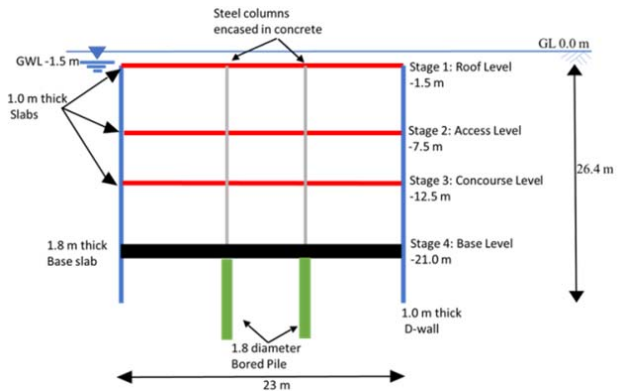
Geometry of retaining structures used in the Sukhumvit station excavation
